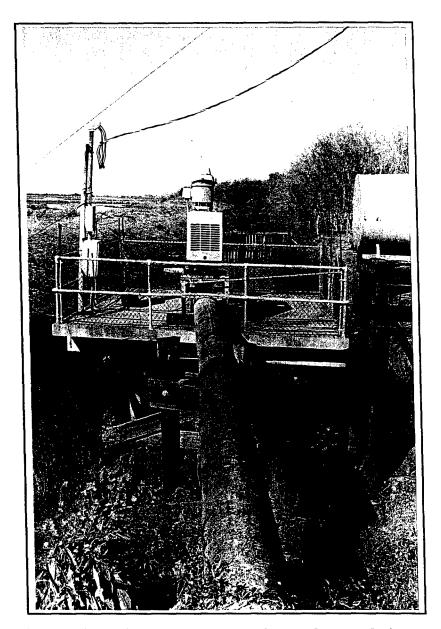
The southernmost impoundment drainage pump located near the Isle de Jean Charles road, along the west side of Bayou Pointe au Chien. Along lower Bayou Pointe au Chien there are at least 100 camps and homes that are outside this impoundment area. Date: December 30, 1997.
